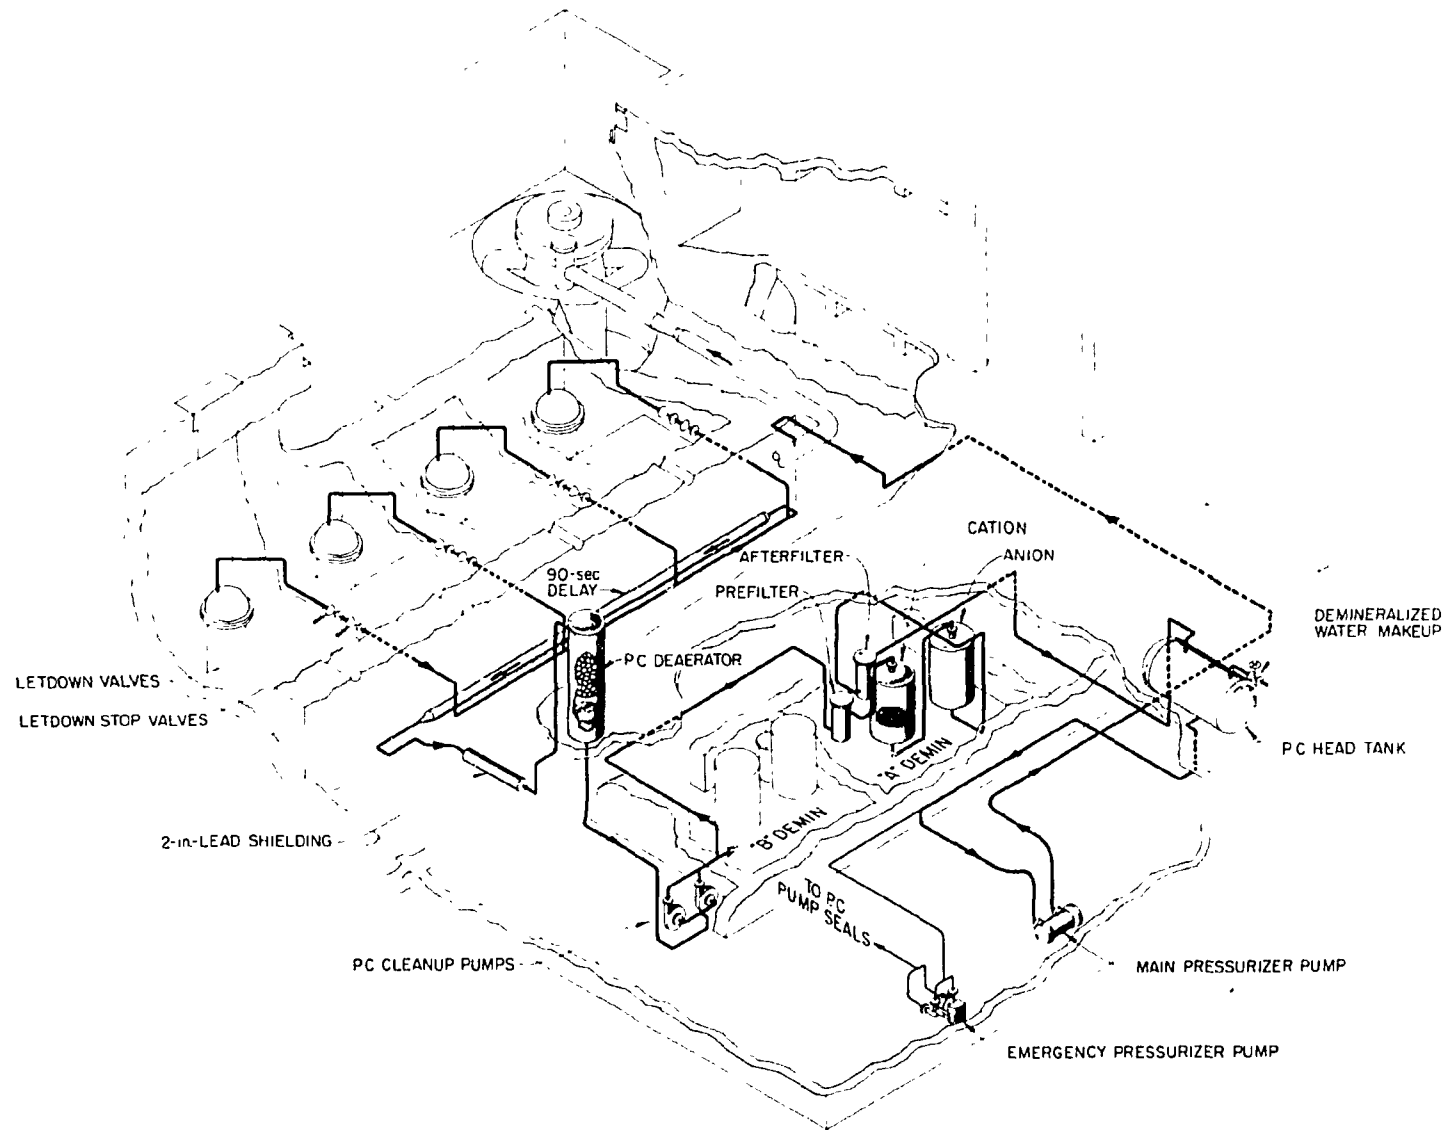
Primary coolant cleanup equipment arrangement.
